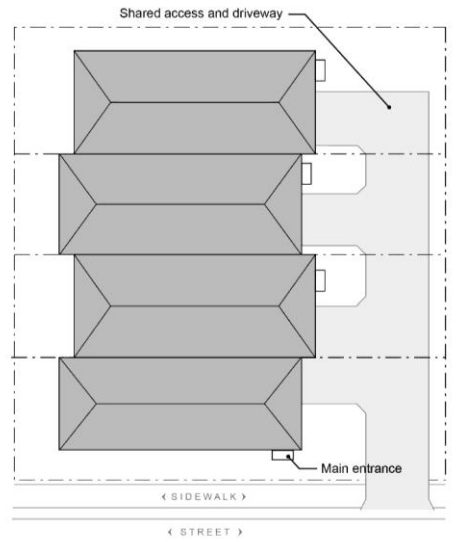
Townhouses with Access from Shared Driveway and Access Easement/Tract
